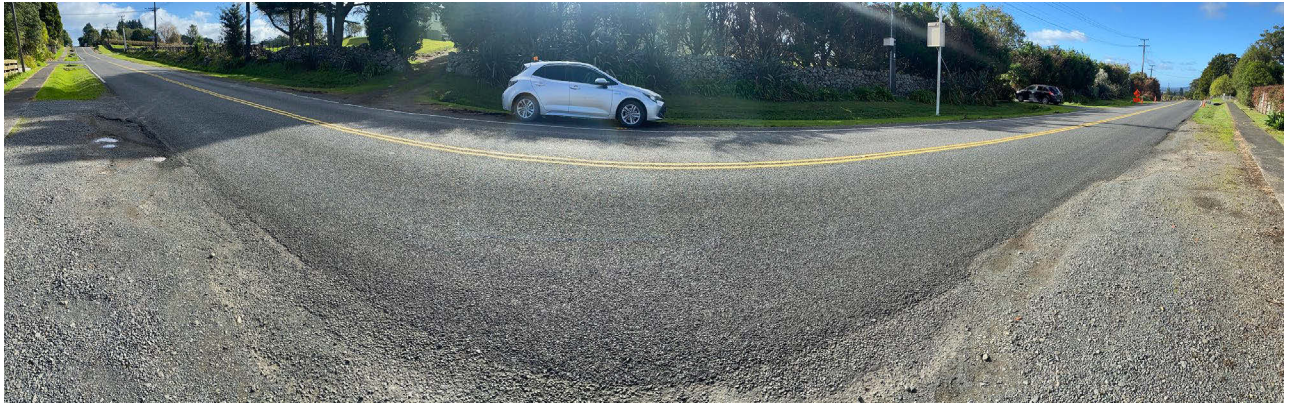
Looking east along Three Mile Bush Road from the proposed intersection location.
